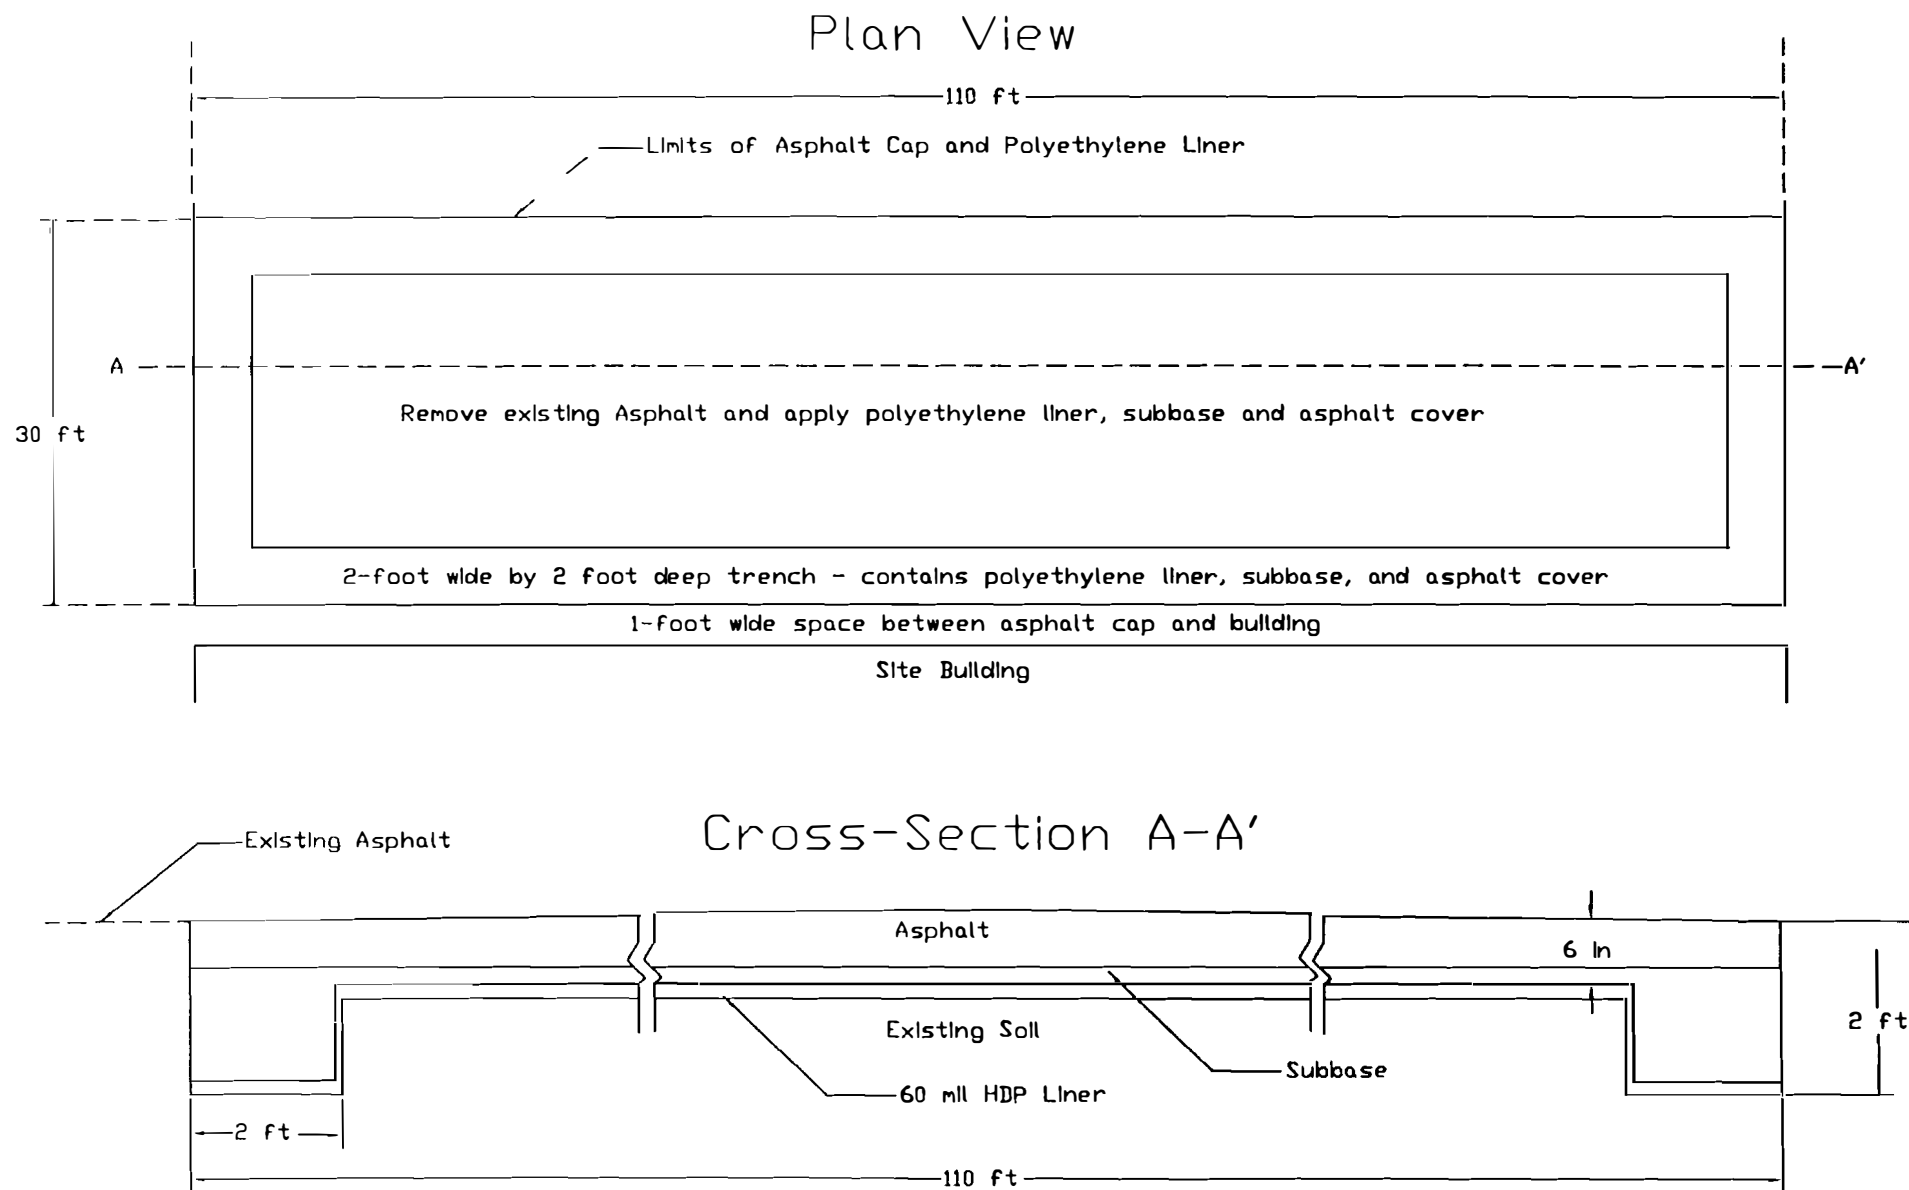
Plan View and Cross-Section of Asphalt Cap
